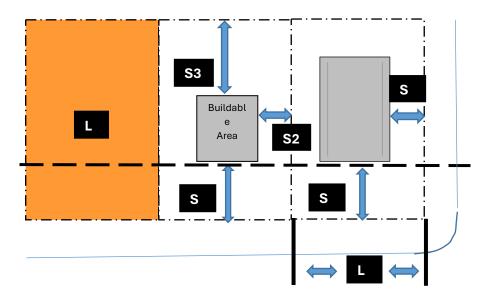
Residential Lot and Building Regulations (Conventional Development) (amended 8-6-2018)
